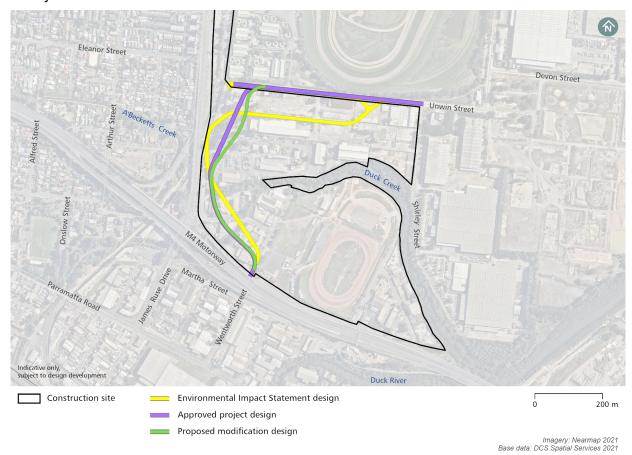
Kay Street and Unwin Street realignment (alternatives)
